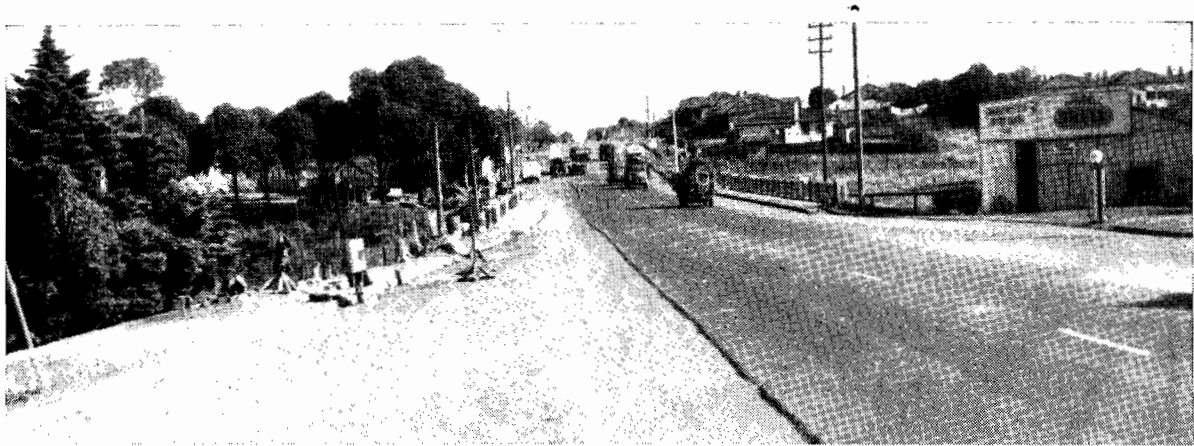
New bridge and approaches over Merri Creek in Bell Street.
